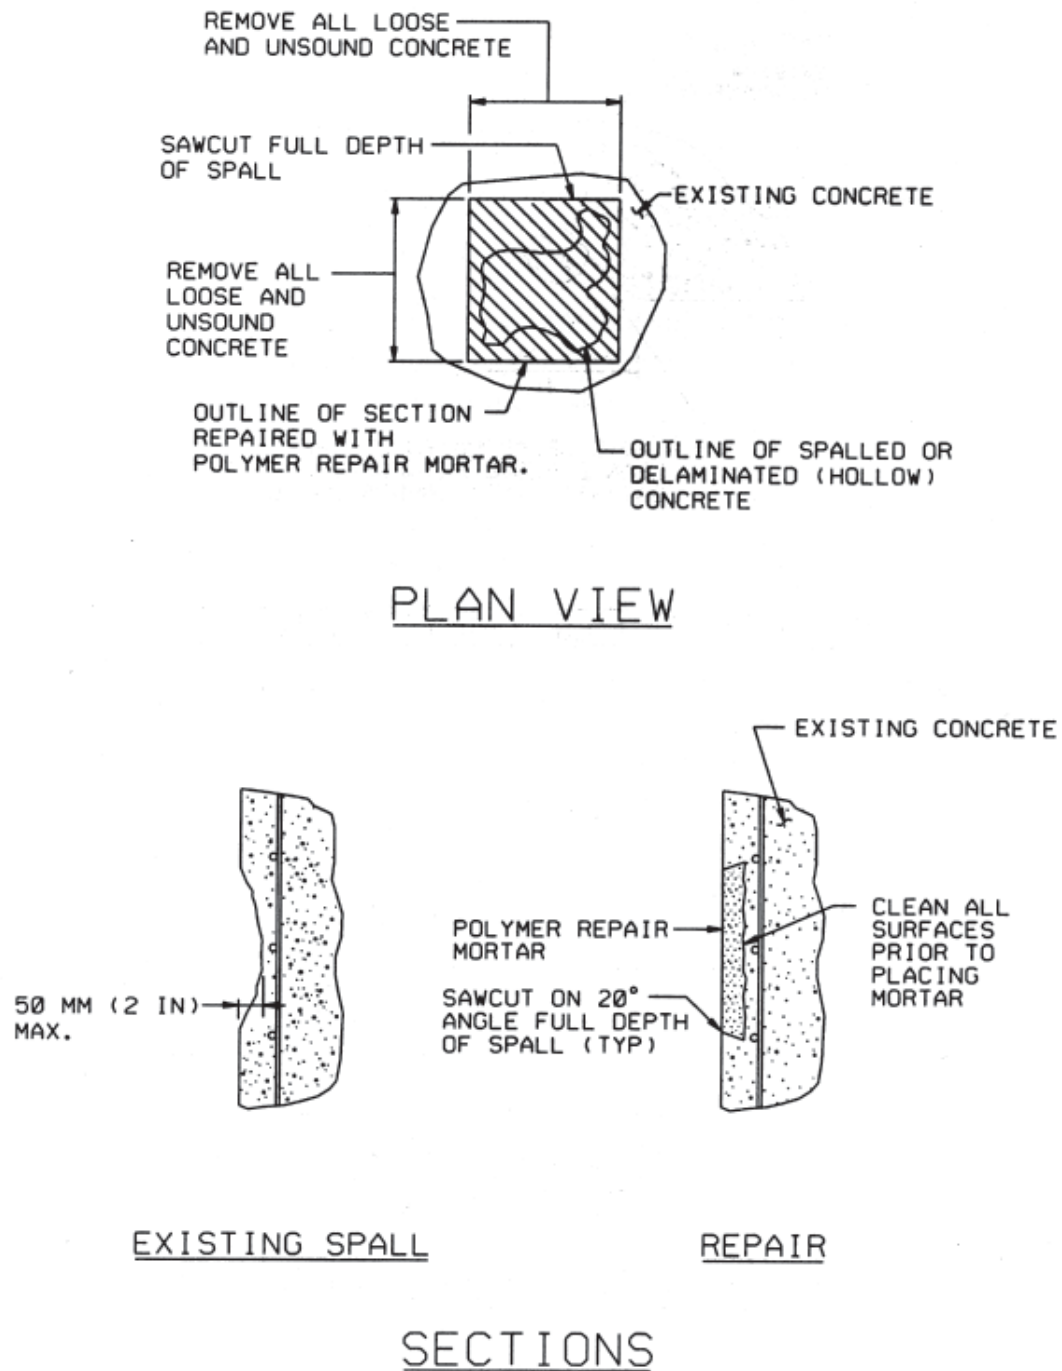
Shallow Spall Repair (FHWA, 2005b)
